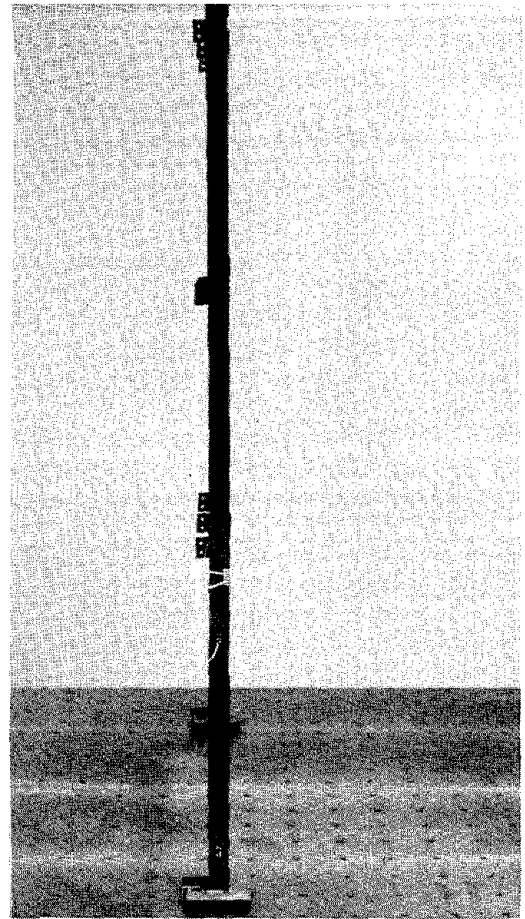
Girder-to-Column Connection Before Heat-Treatment
